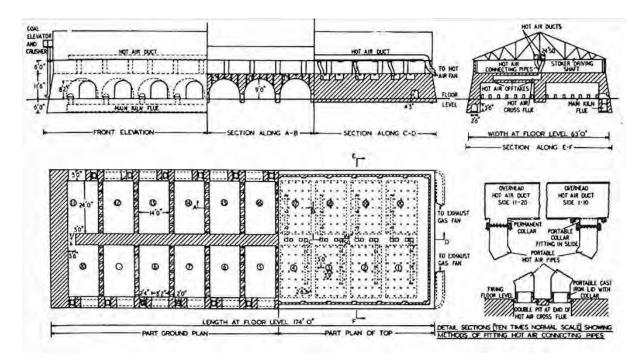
Plan, sections, front elevation and details of a Staffordshire kiln. (Source: Martin Hammond, Bricks and Brickmaking, p 25)
